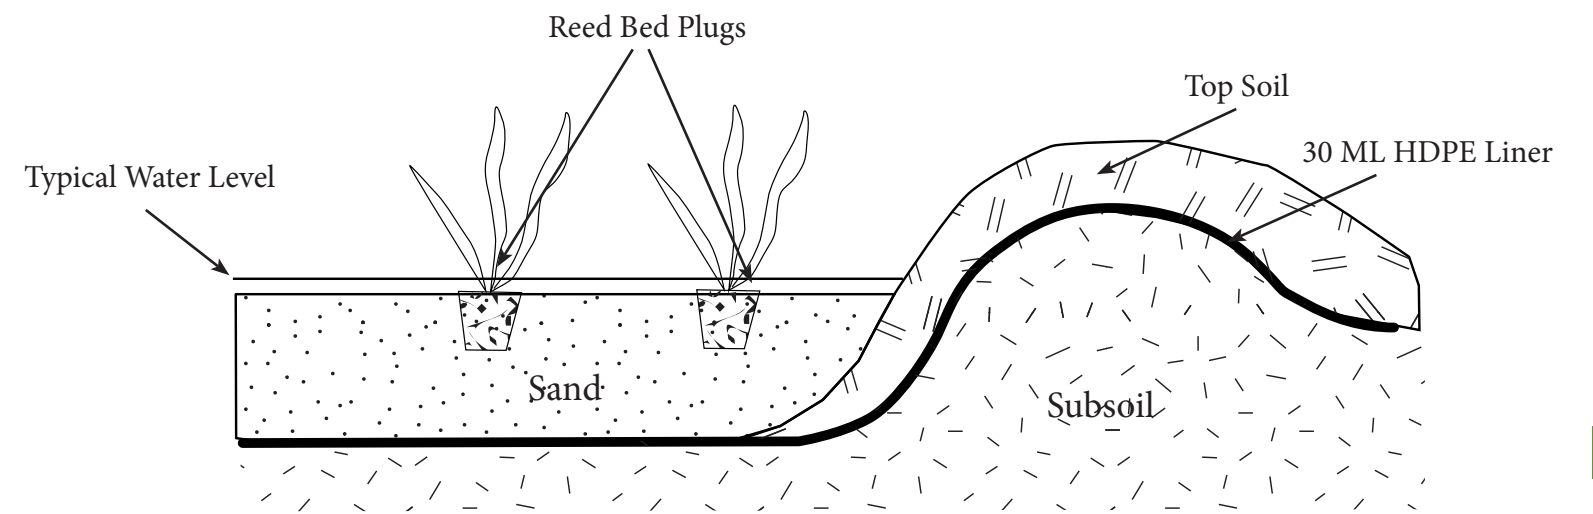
Section view of the reed bed design to show how the liner is placed and how the planting matrix is designed.
